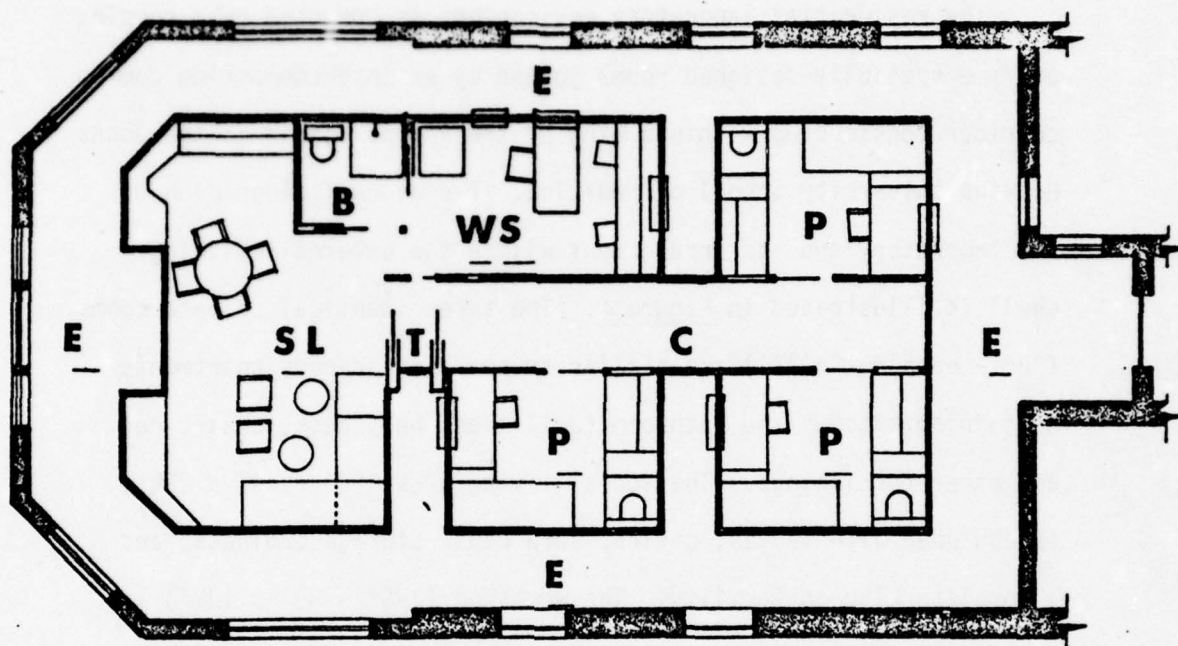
Diagrammatic representation of the overall floor plan of the laboratory and its arrangement within the external building shell.
